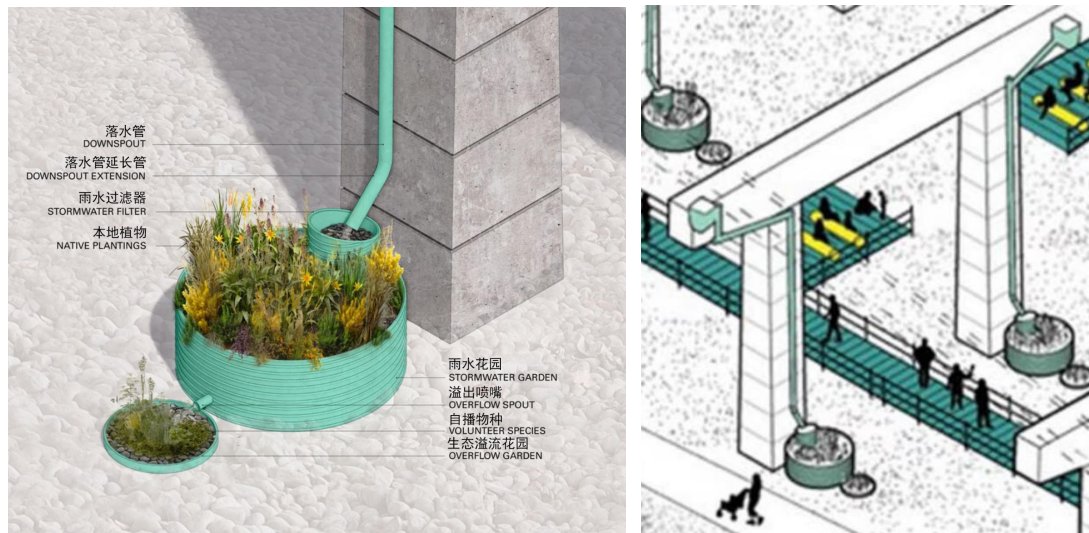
Schematic diagram of rainwater installation on bridge pillars
